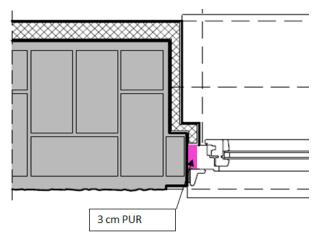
Window reveal connection of an internally insulated wall, position of the window almost flush with the outside. Attention must be paid to a continuous insulation level.
